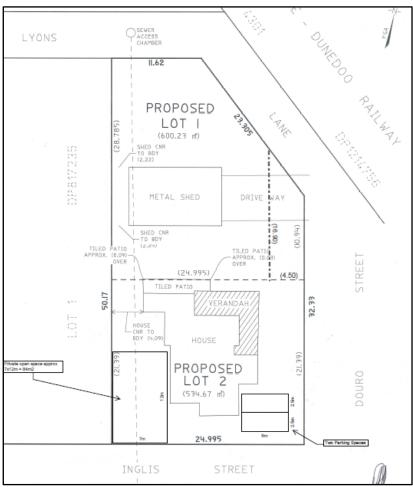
Extract of proposed subdivision plan showing location of private open space and parking within Lot 2.
